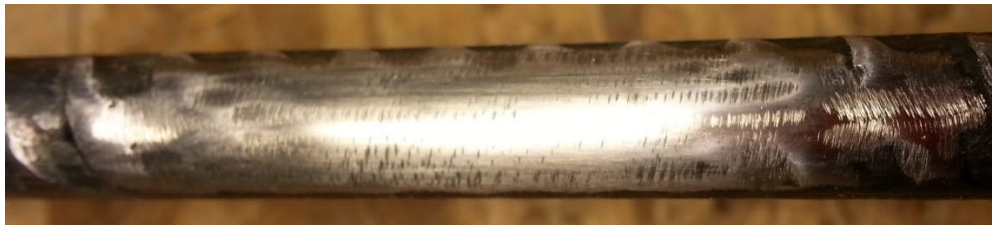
Deformed steel reinforcement with ribs ground down and sanded
